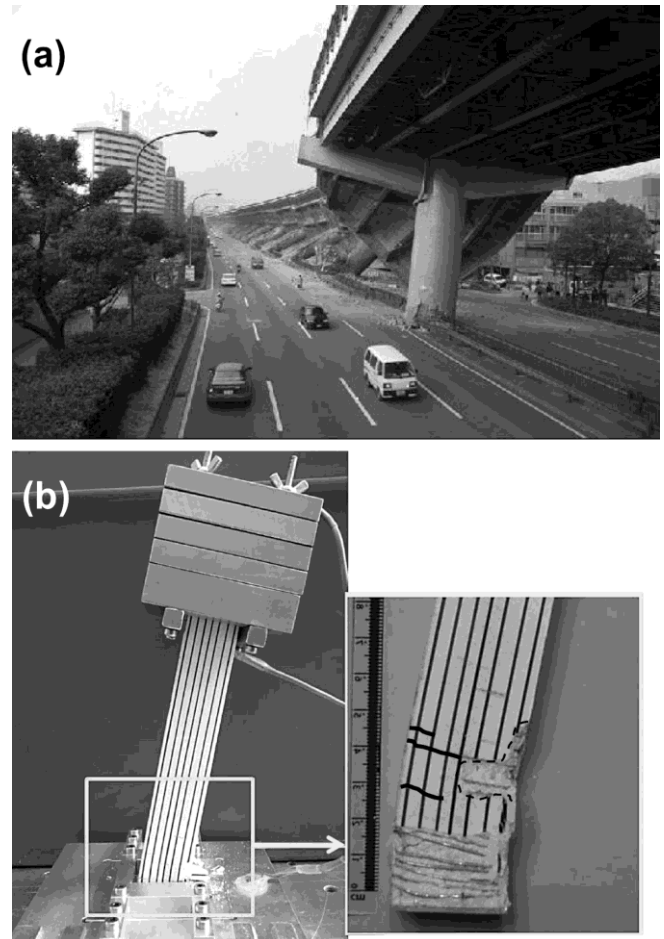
(a) Damage to Hanshin Expressway following 1995 Kobe earthquake; (b) damage to model RC bridge pier model in centrifuge test.
